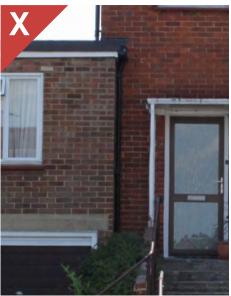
An example of a side extension that attempts to match the existing brick work but fails to do so.
